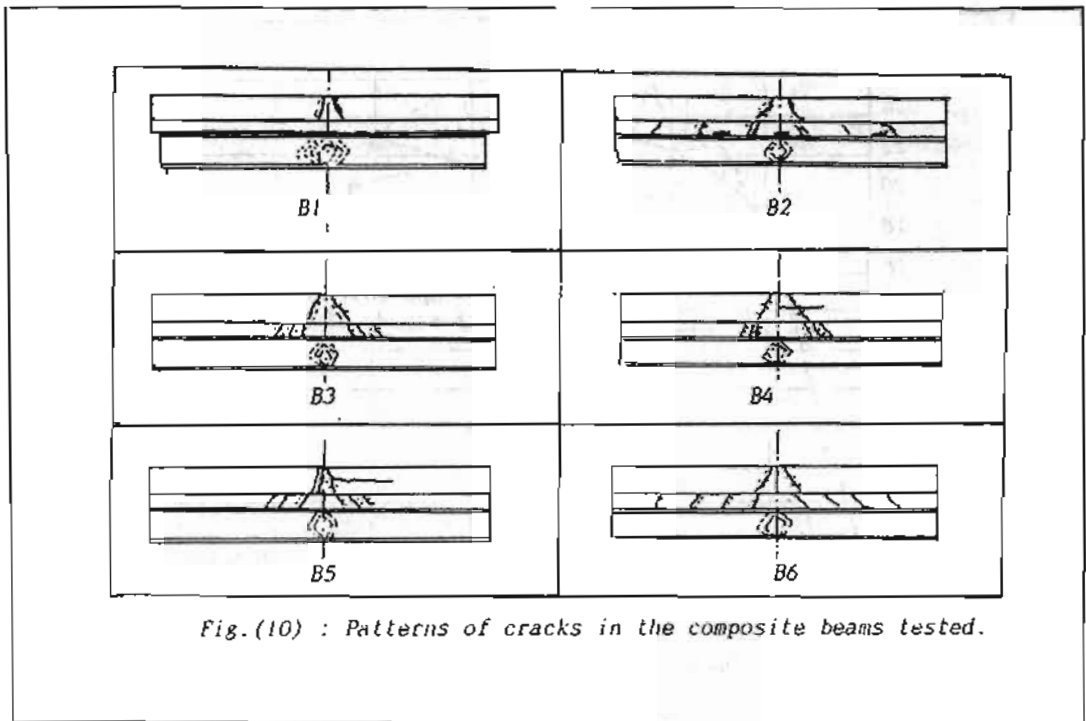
Patterns of cracks in the composite beams tested.
